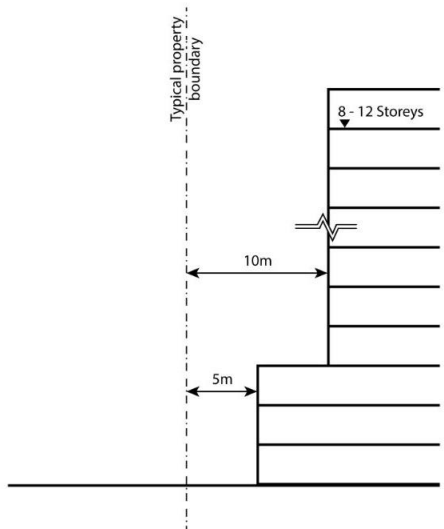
Frontage to Springvale Road, High Street Road and Snedden Drive
